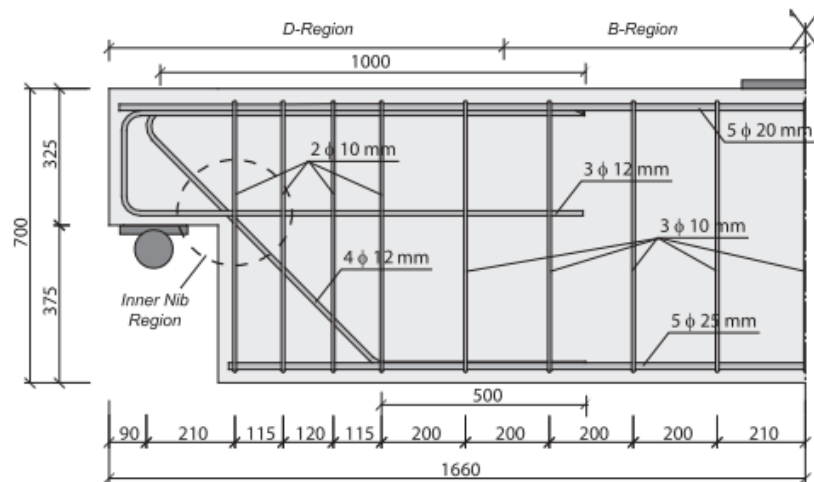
Geometry of the specimens and reinforcement layout [17]
